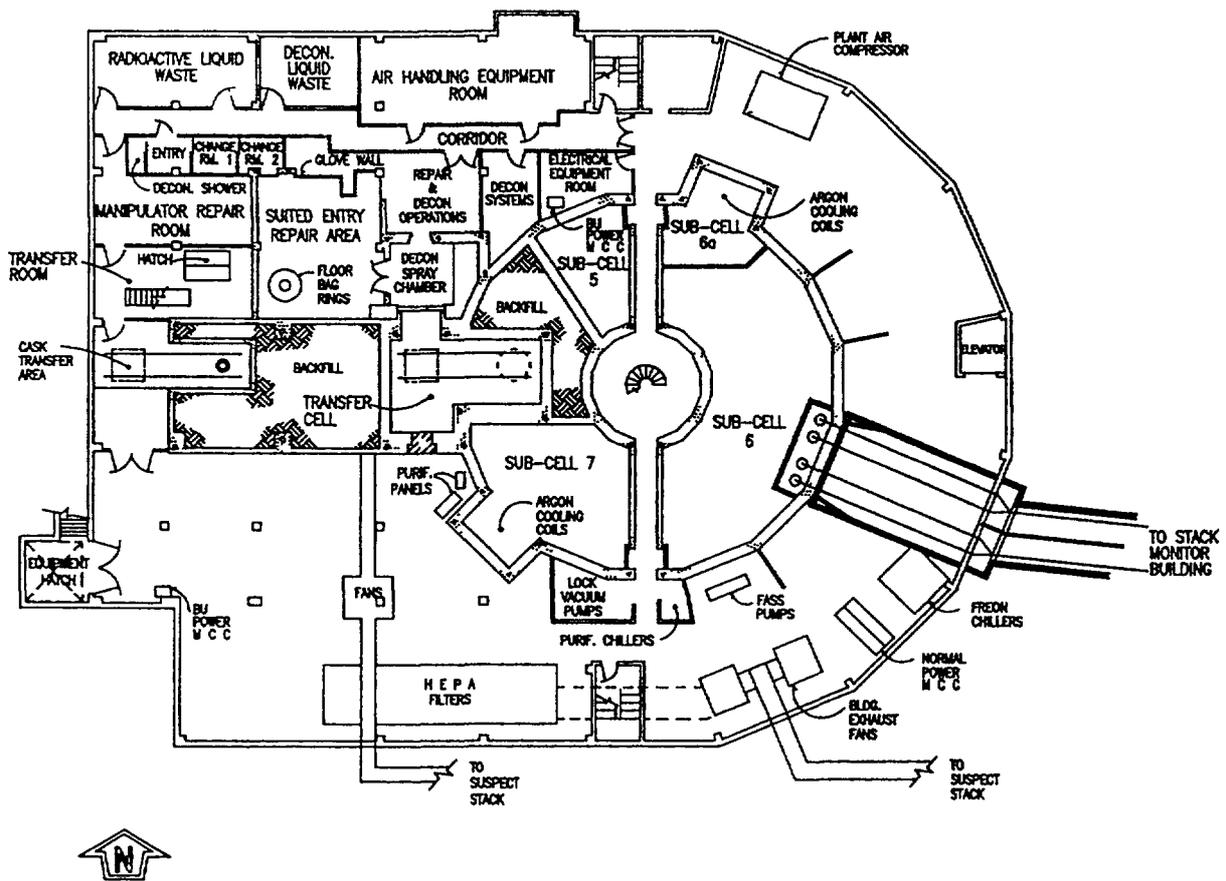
HFEF/S basement floor plan with conceptual modifications.
